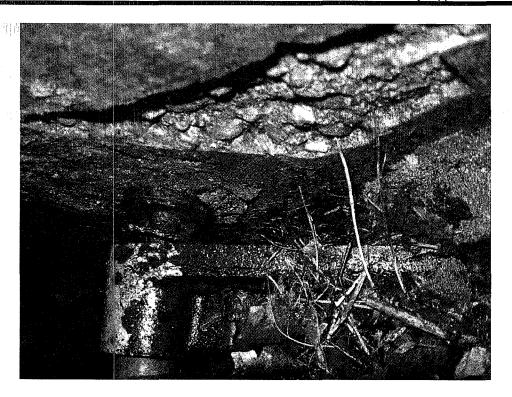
Corroded connections on 48" sluice gate & deteriorated headwall (Station 0+50)
